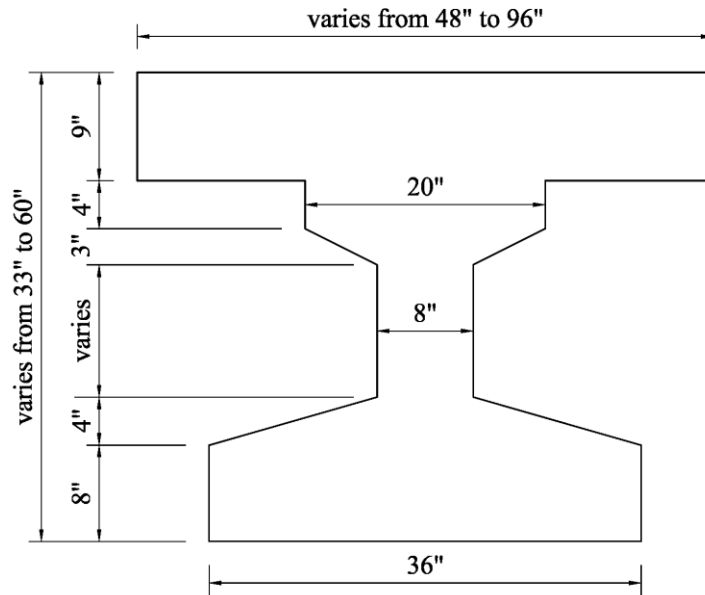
Typical cross section dimensions for full-scale decked bulb T beams
